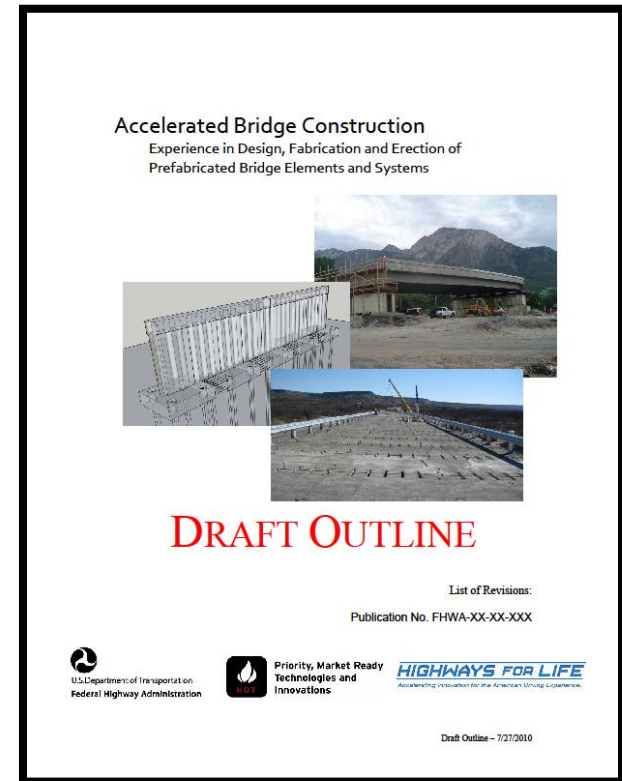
Draft Outline on Accelerated Bridge Construction (www.super-slab.com)
